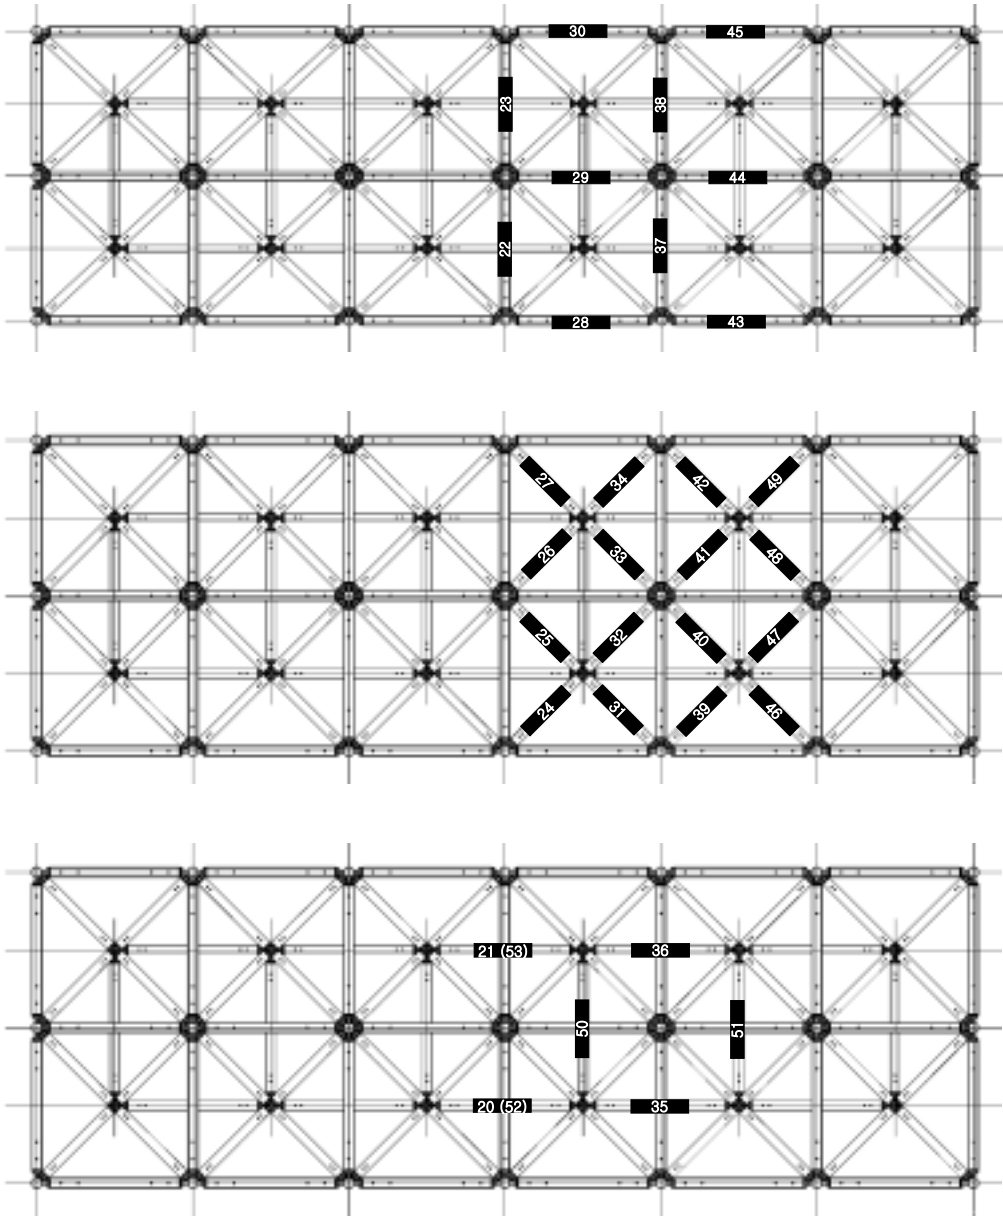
Position of strain gage for full-scale test specimen of wood space truss
